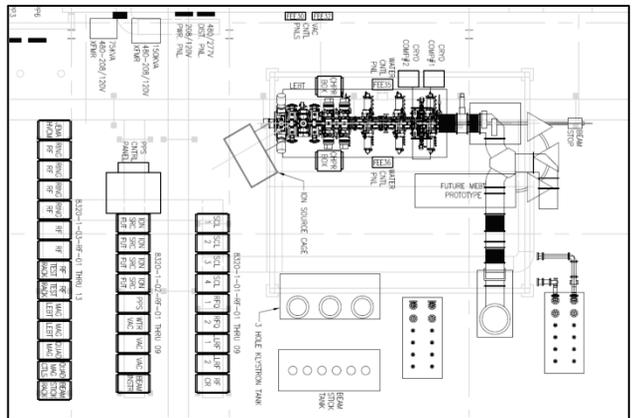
Layout of the front-end test stand. The beam direction is to the right (north).
